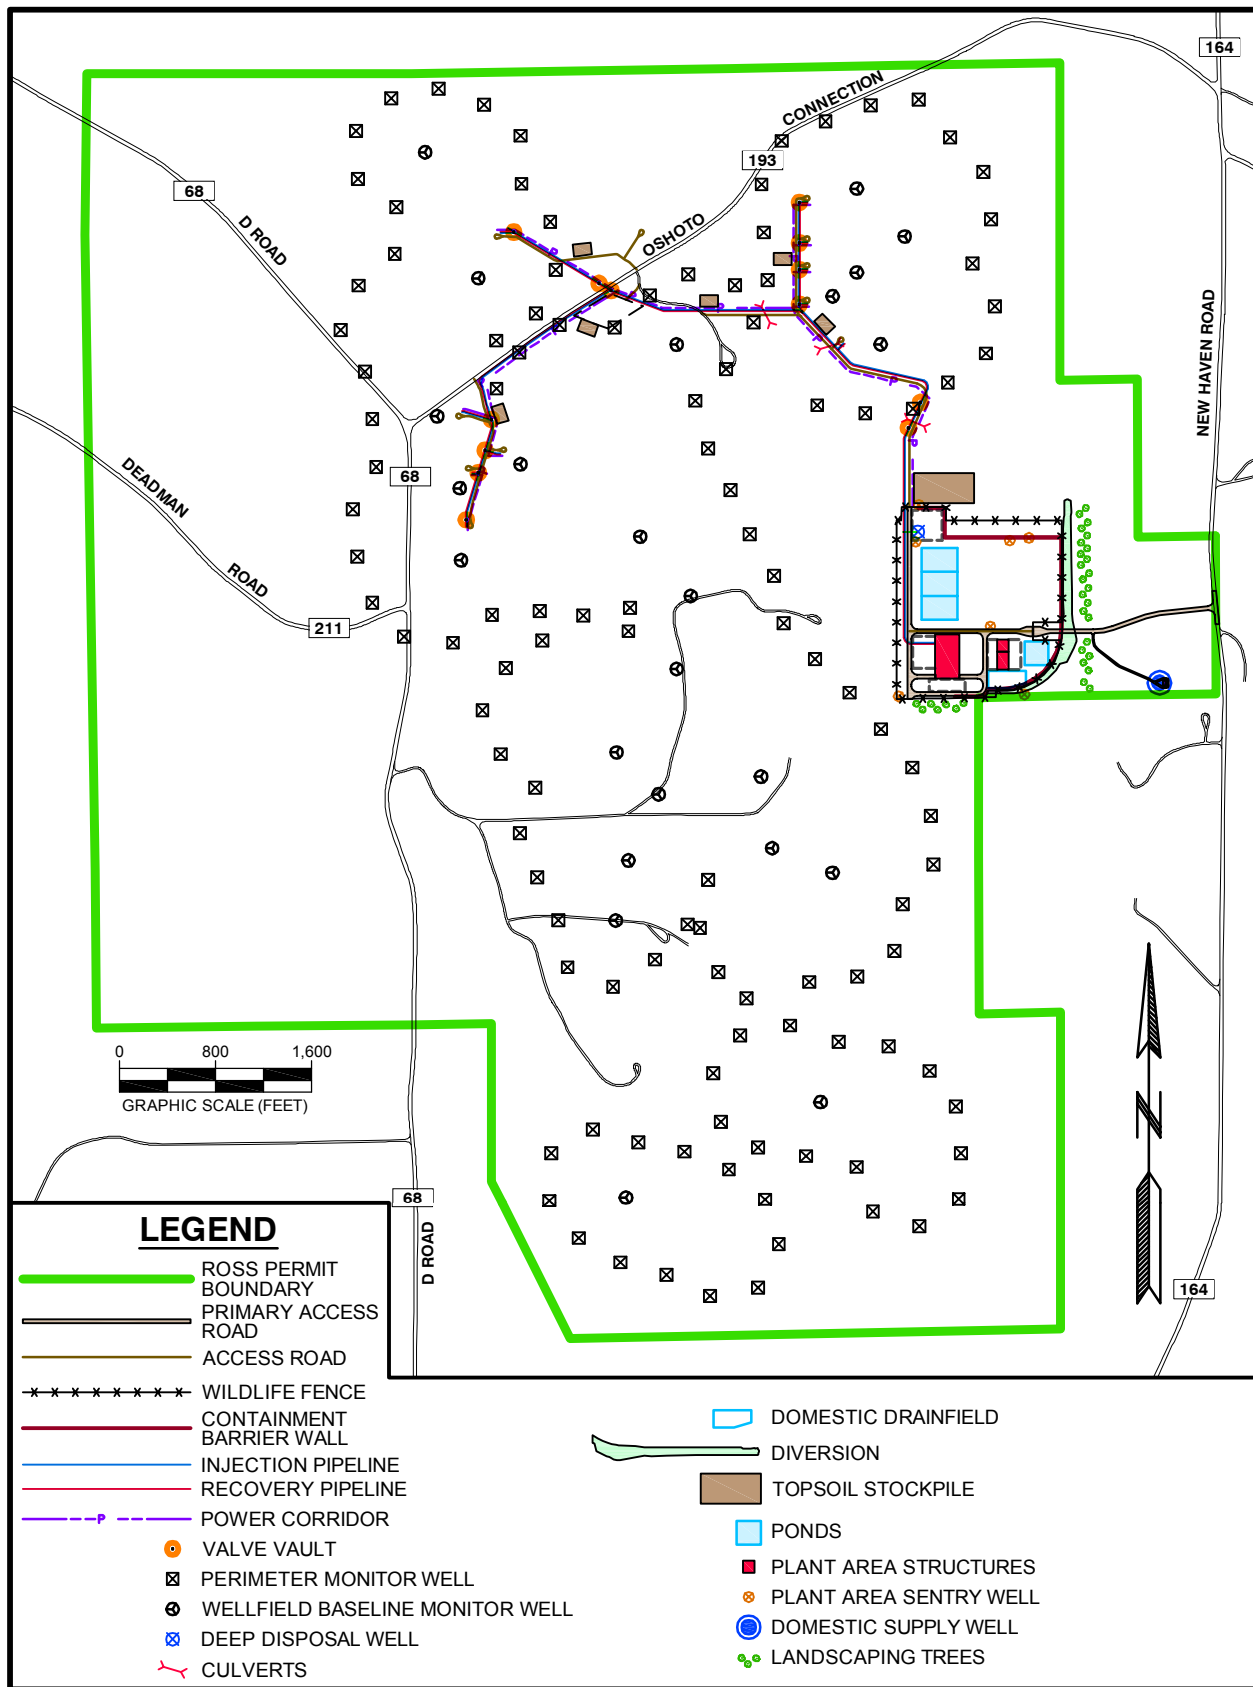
Figure ER RAI GEN-1-2. Anticipated Facilities at the End of Construction.
